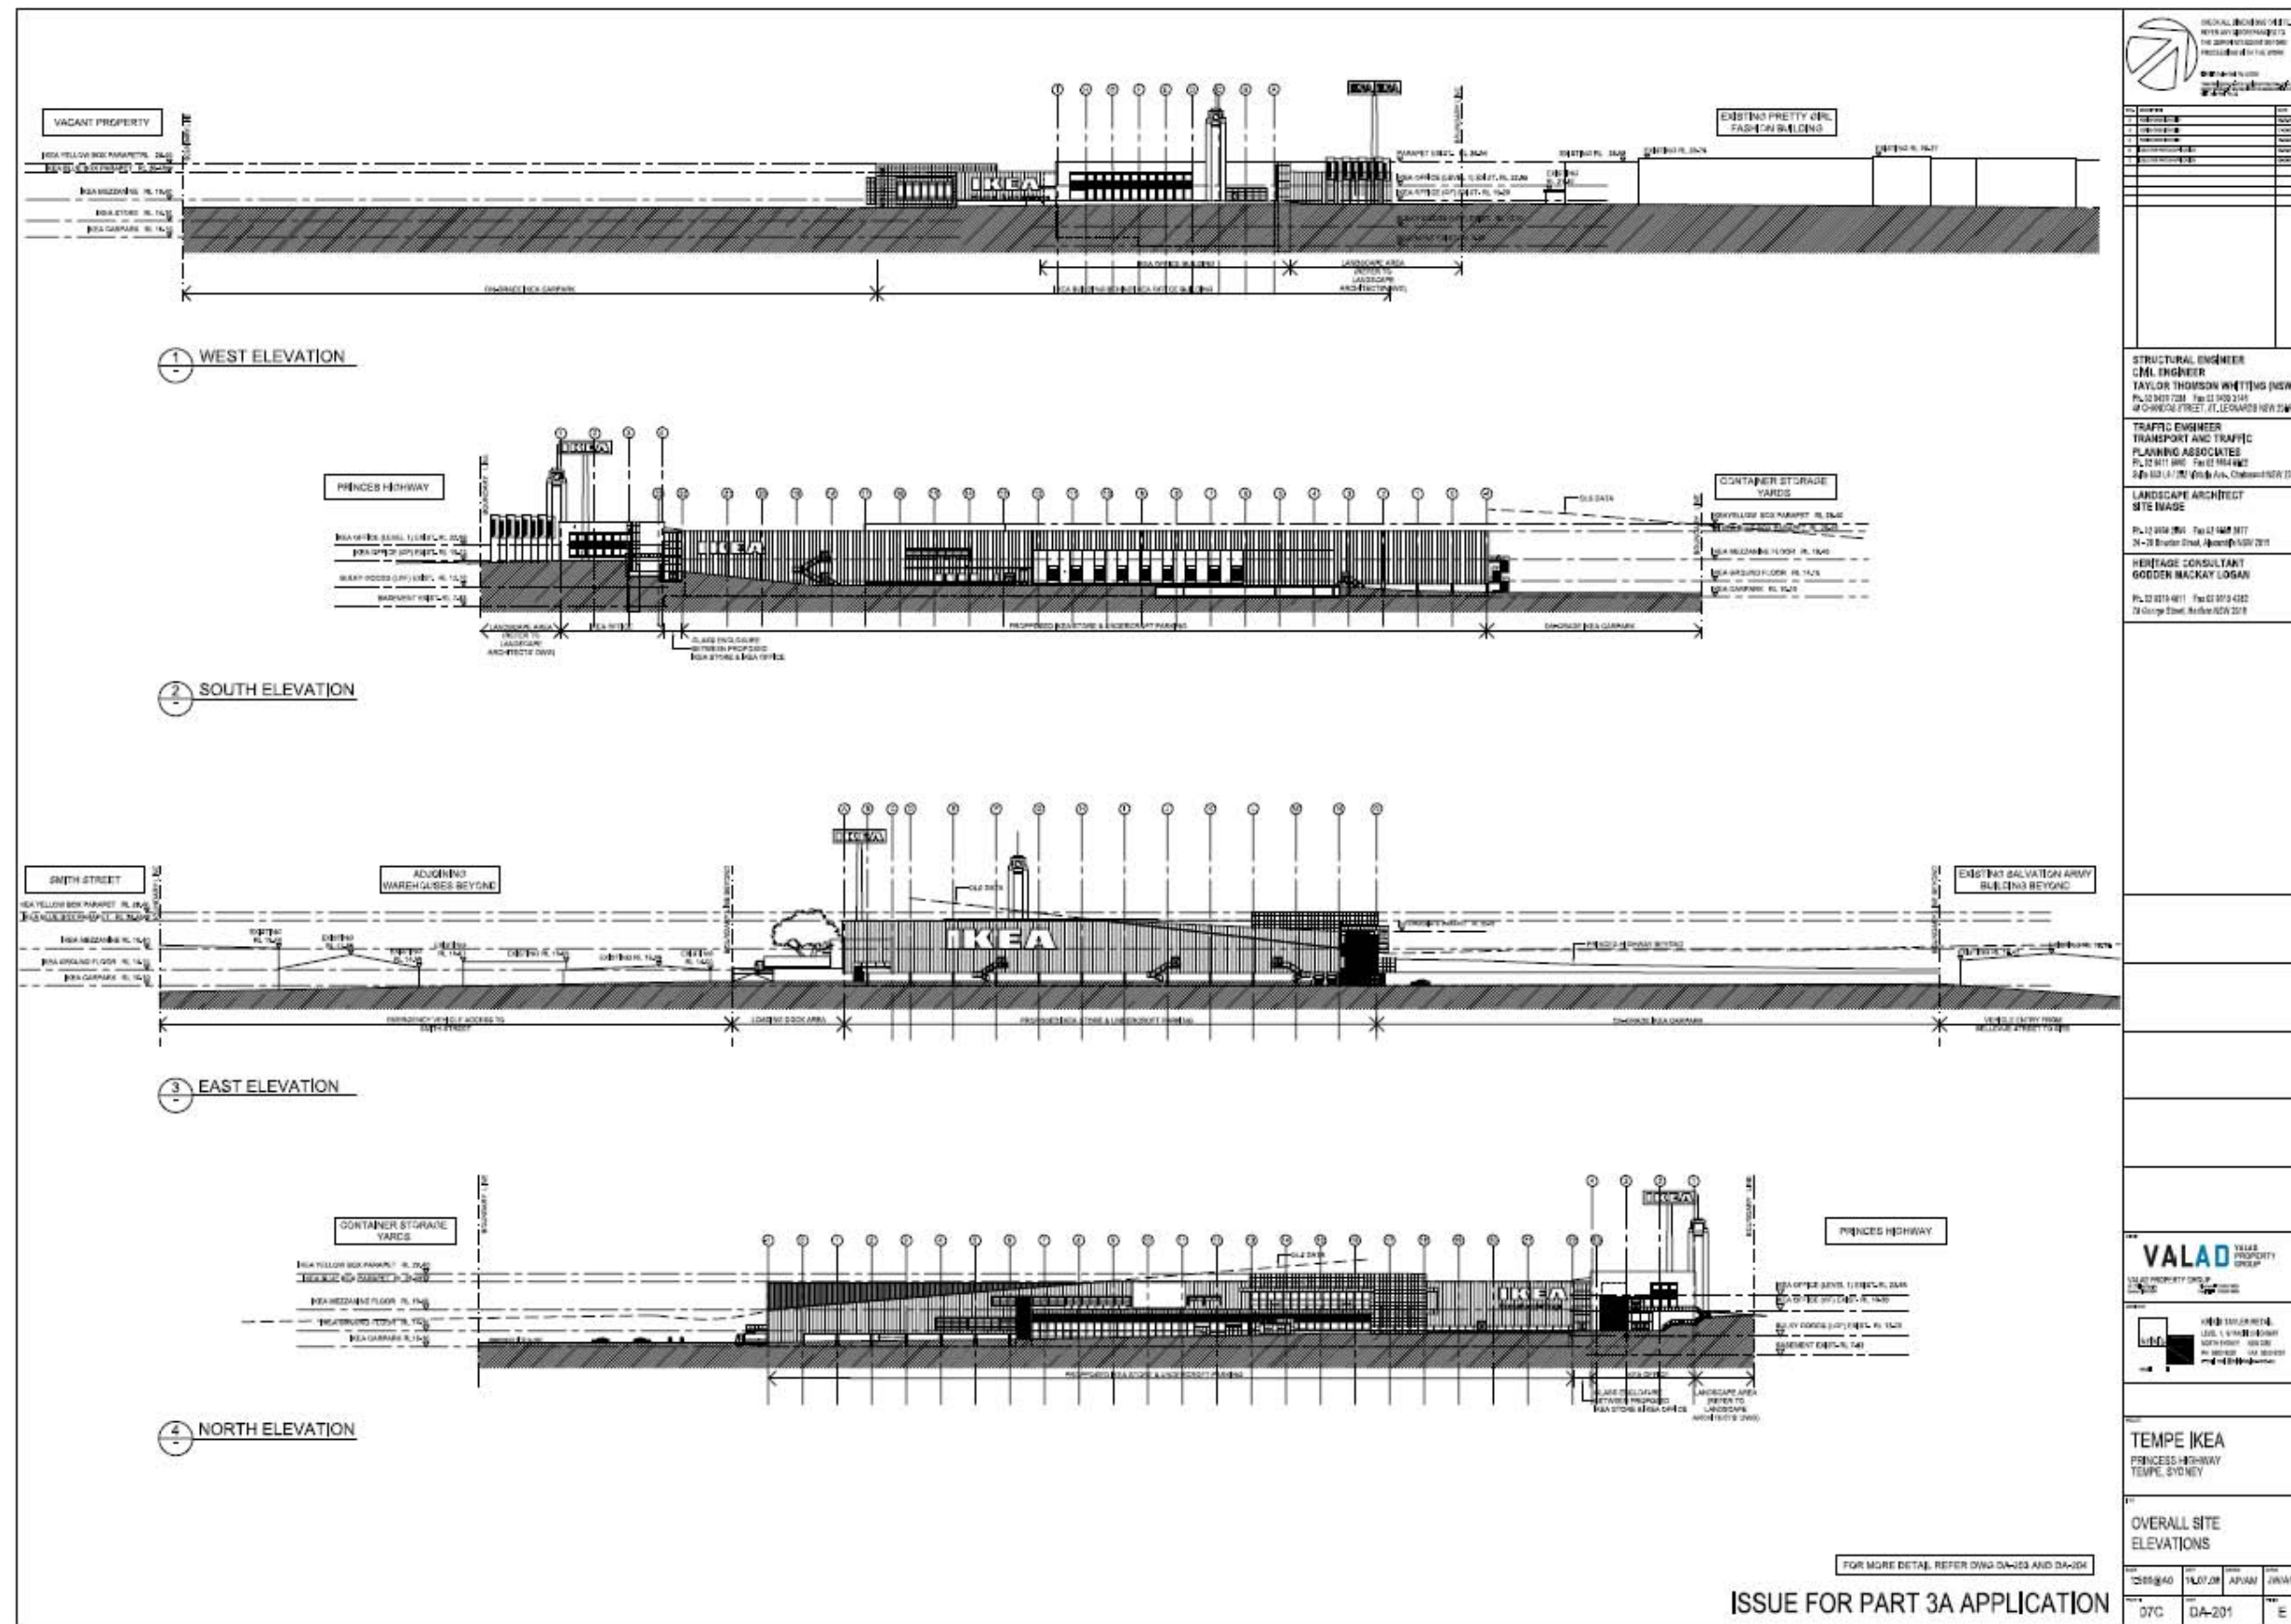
Elevations showing proposed and existing levels across the subject site. (Source: Krikis Tayler)
